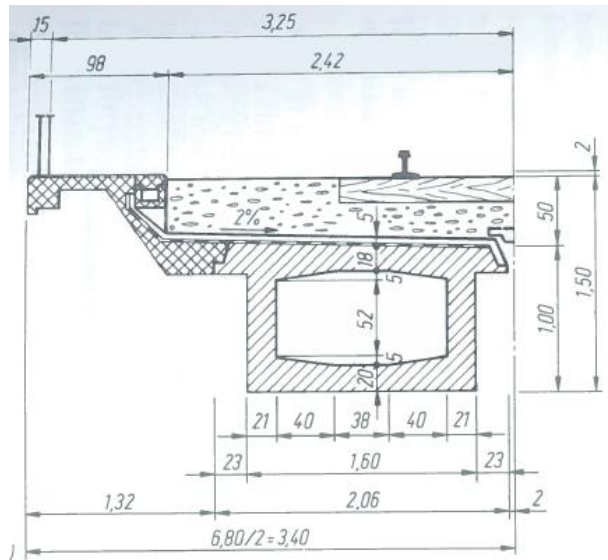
box girders (spans 11,20 m and 14,20 m) [U12]
